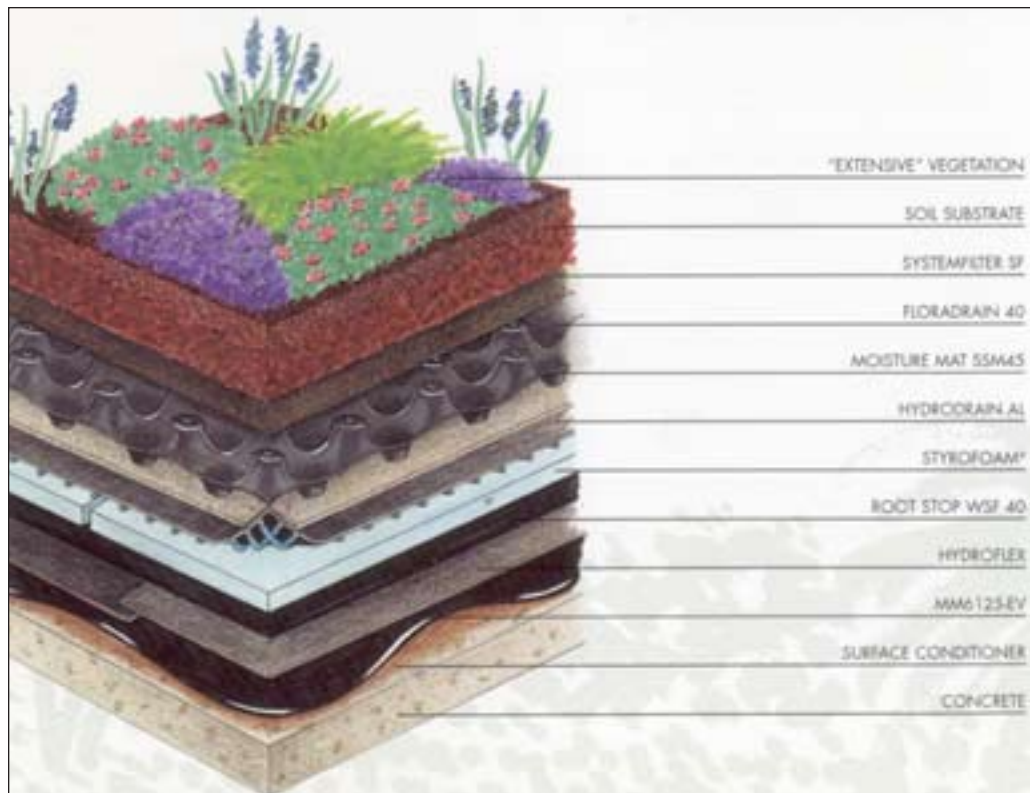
Schematic Cross Section of An Extensive Green Roof, Source: American Hydrotech Inc.
